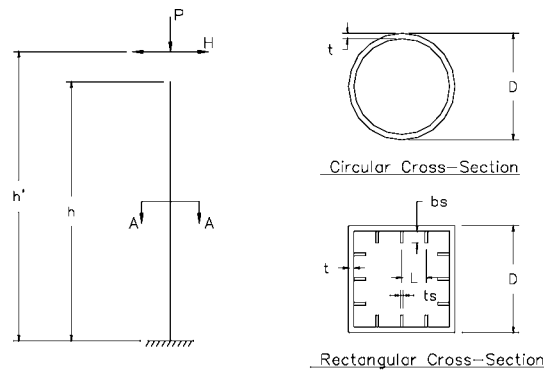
Cross Sections of the Tested Specimens by Nishikawa et al. (1996)
